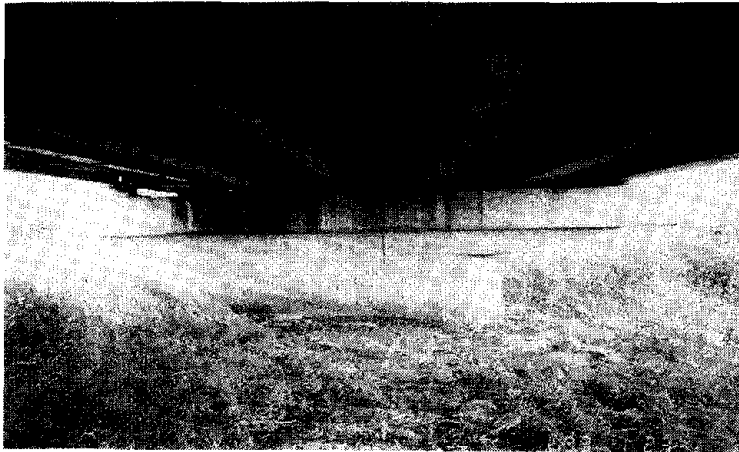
Inclination of Piers and soil Liquefaction (Oshamanbe Bridge, Pier P2)
